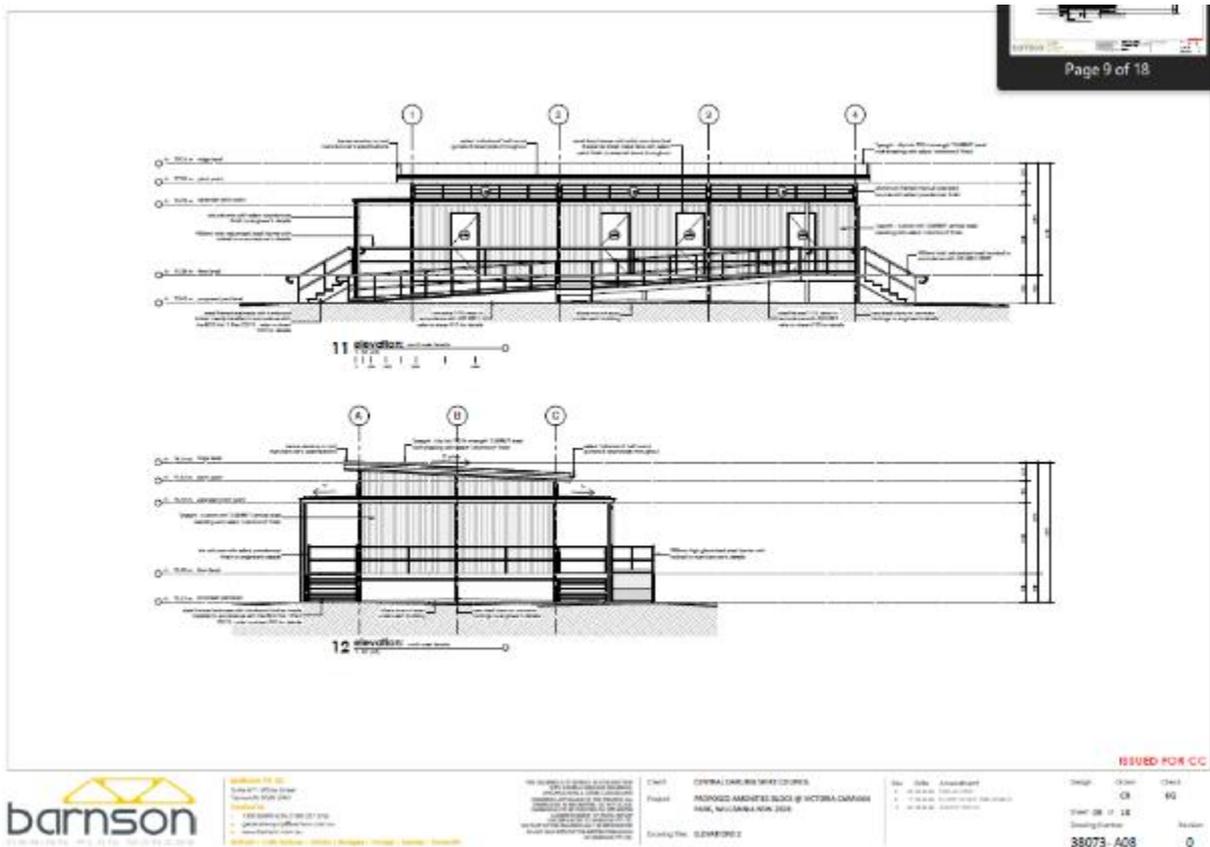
Elevations of the proposed amenity block at Victory Caravan Park ( Source: Barnson 2022).
